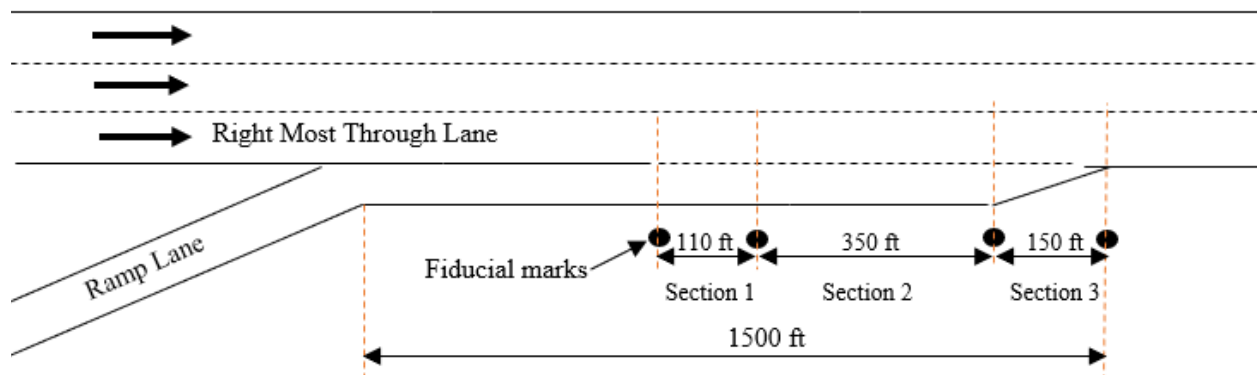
On-Ramp Geometry -I-75 at Pine Ridge Road (Not to Scale)
